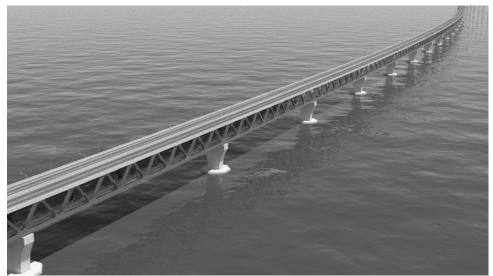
Padma Bridge will be a two-level structure with the highway running on the top concrete slab and the railway running between the chords of the truss.
